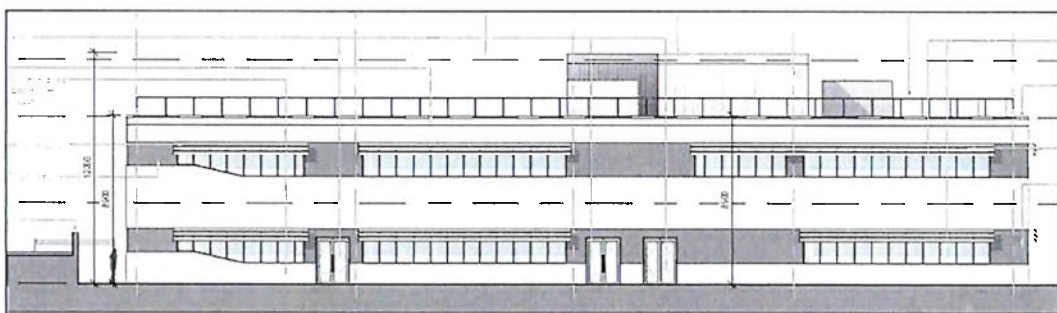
Proposed SASC western elevation (Pascall + Watson, 2023).
